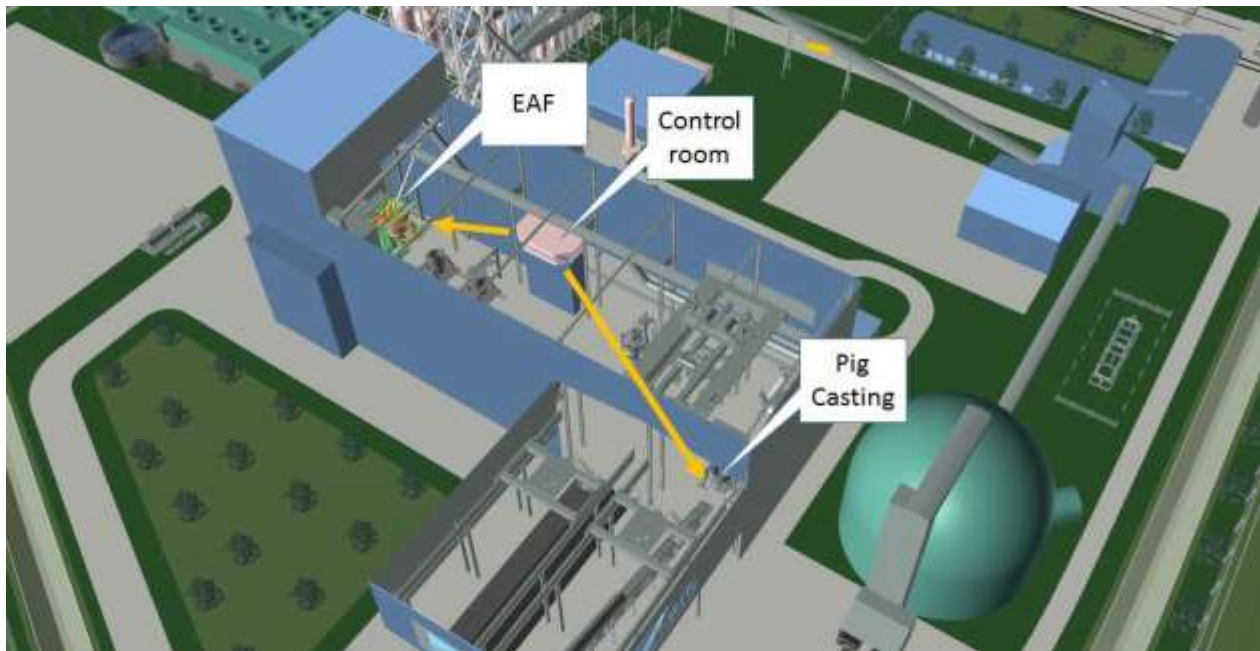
position of the control room in the main building bay, overlooking EAF and Pig Caster
